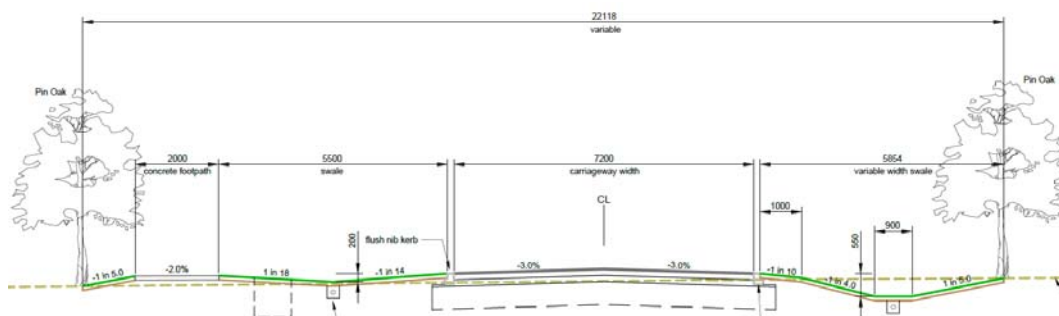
Example Cross-Section of Proposed Road (Extract from Paterson Pitts Drawing 'Proposed Access Road Typical Cross Sections', Q6388-15, Sheet 13 Rev B)
